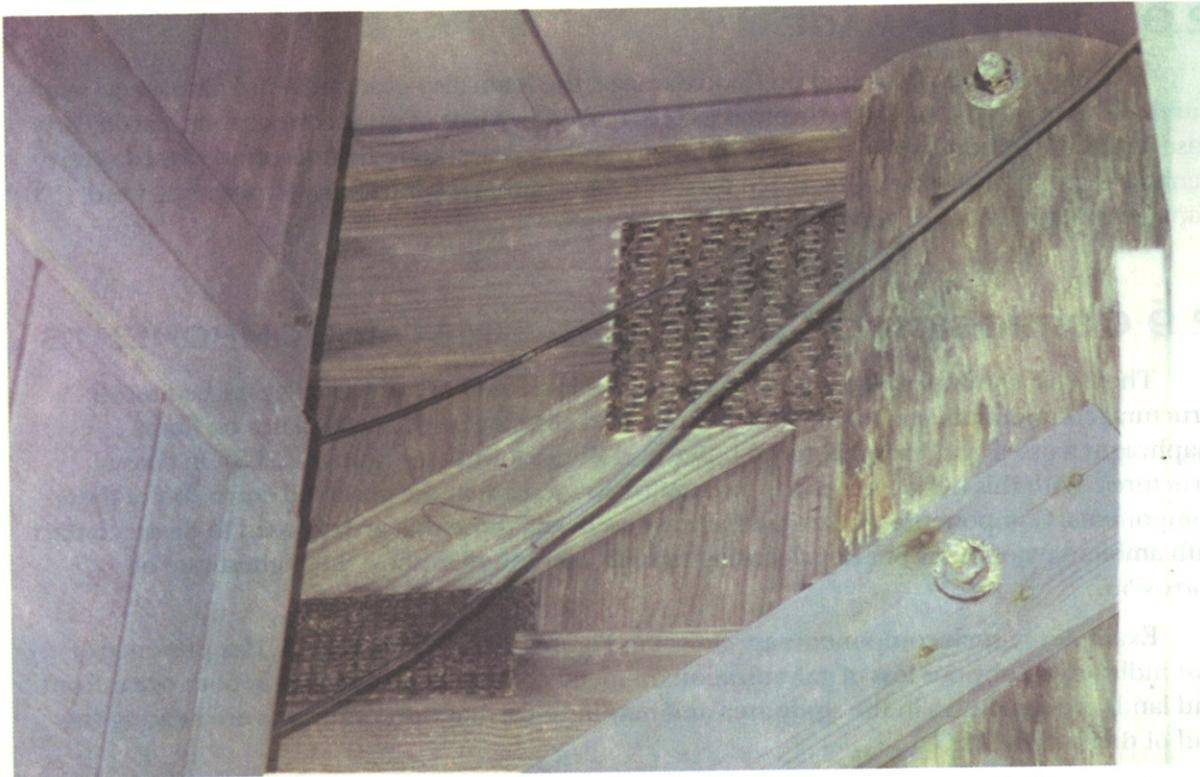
Corrosion of galvanized floor truss plates was observed in many buildings.
